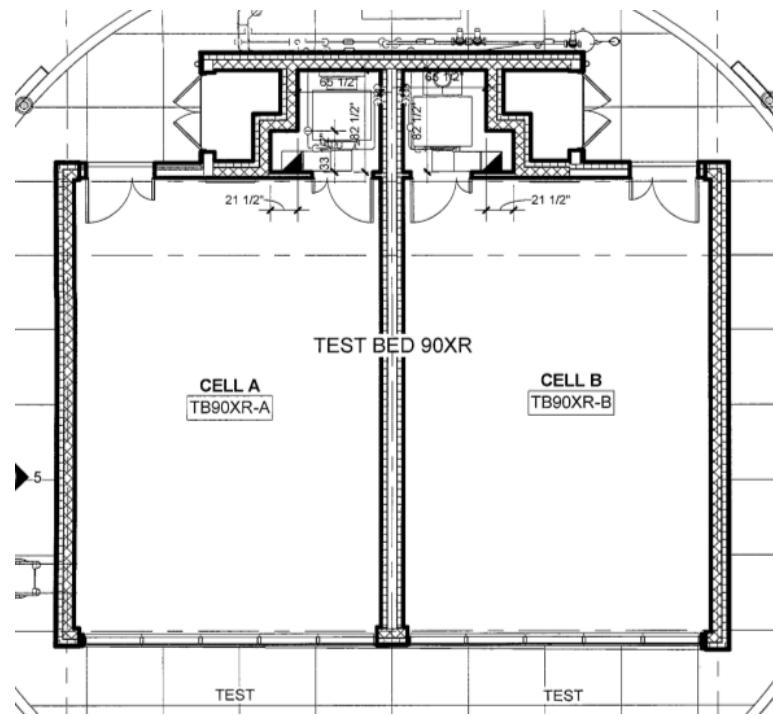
Floor plan of FLEXLAB testbed showing side by side test cells
